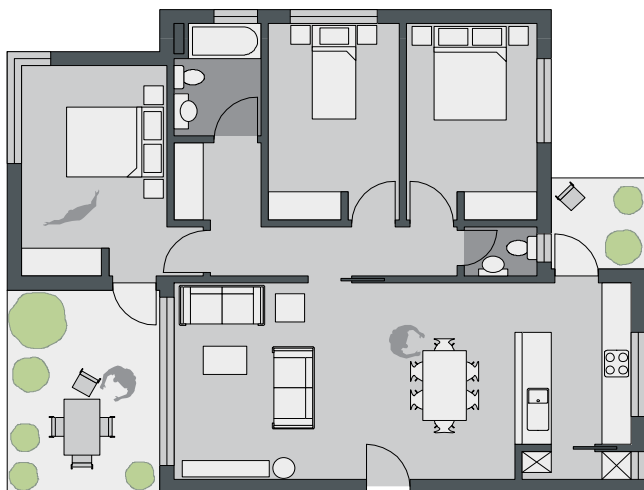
P.3 Building layout should maximise balcony use by allowing access from the main living area and a bedroom (where possible). Secondary balconies provide further amenity to apartment living and are best accessed off kitchens and laundries
